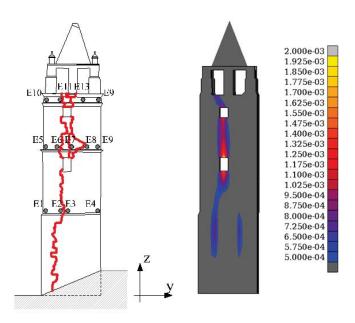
Mogadouro tower east façade: surveyed (on the left) and numerical (on the right) cracking pattern.
